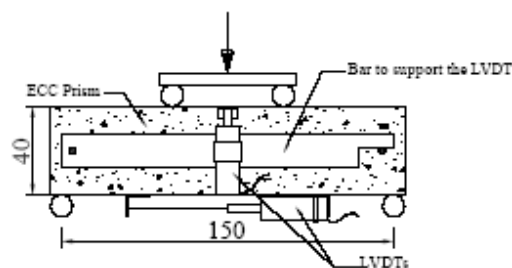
Test setup for four-point bending test using un-notched specimens (dimensions in mm)
